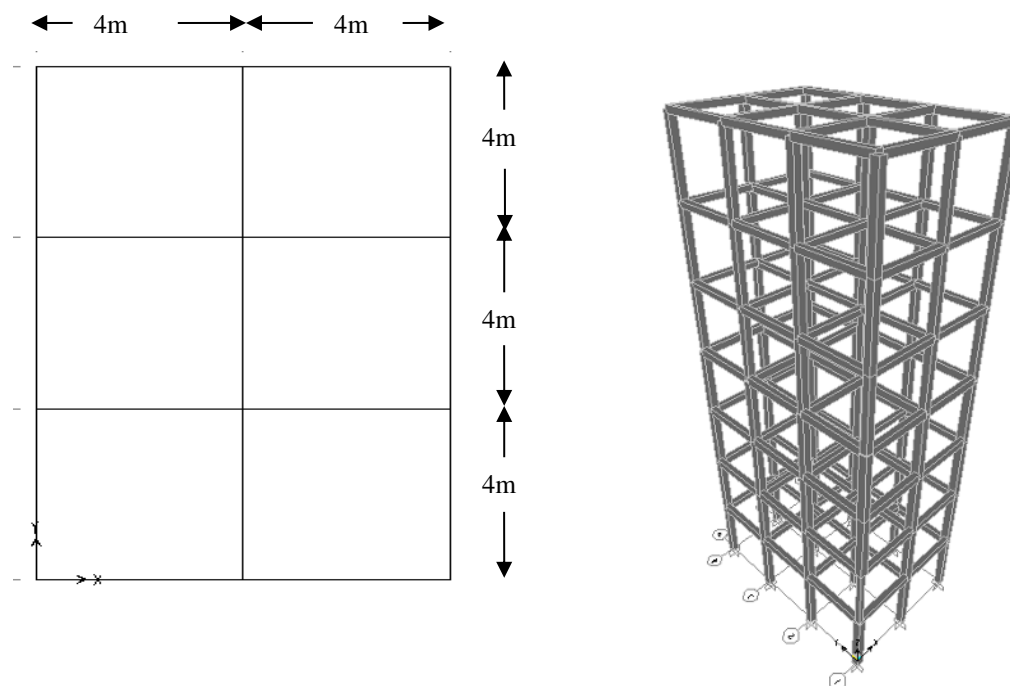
Typical Floor Plan and Three Dimension of the Hypothetical Model
